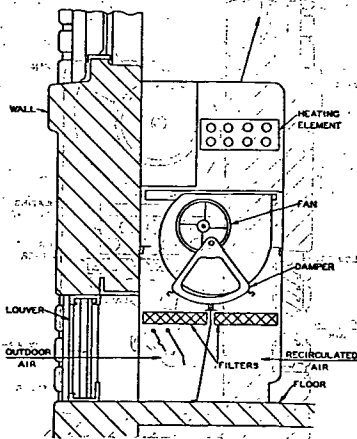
Typical Floor-Mounted Unit Ventilator—Blow-Through Type
